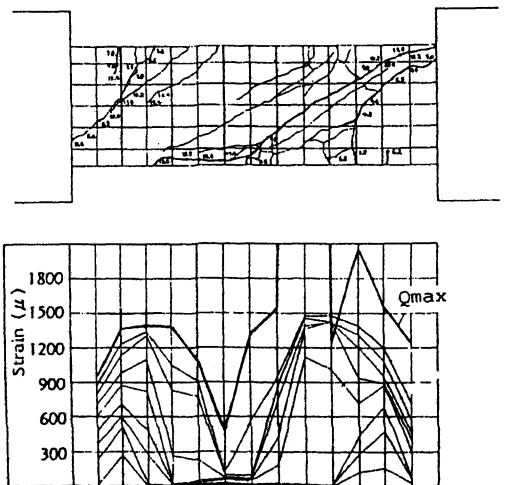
Crack pattern and strain of shear reinforcement of specimen No.1
